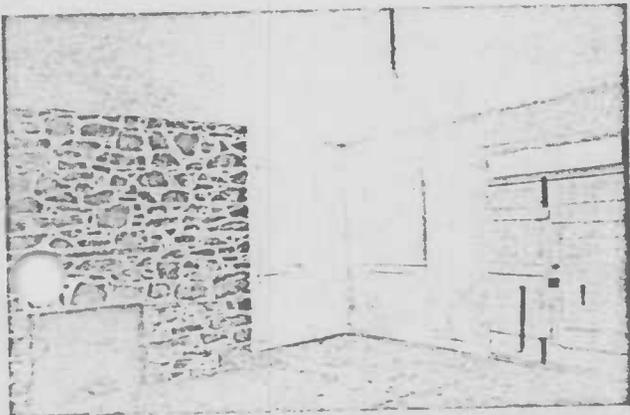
1ST FLOOR FRONT ROOM AND FIREPLACE
